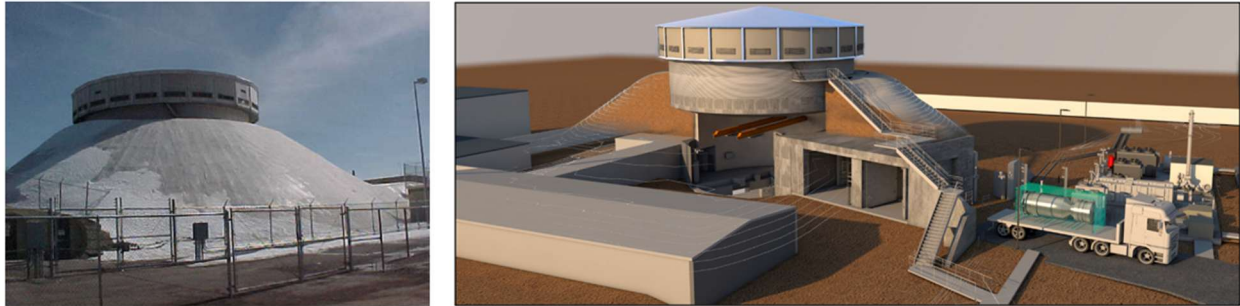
ZPPR building exterior photo (left) and cutaway rendering of LOTUS modifications (right).
